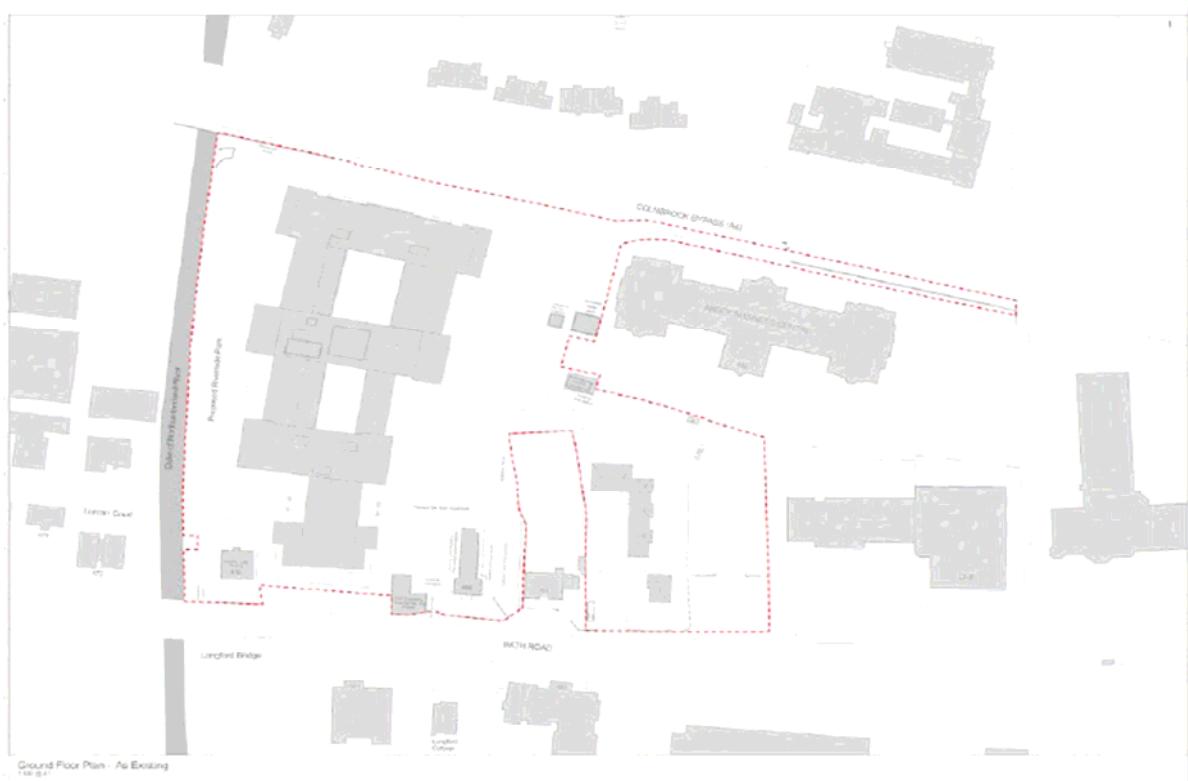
Block Plans and layout of the proposed hotel development (Source: applicant's design & access statement)
